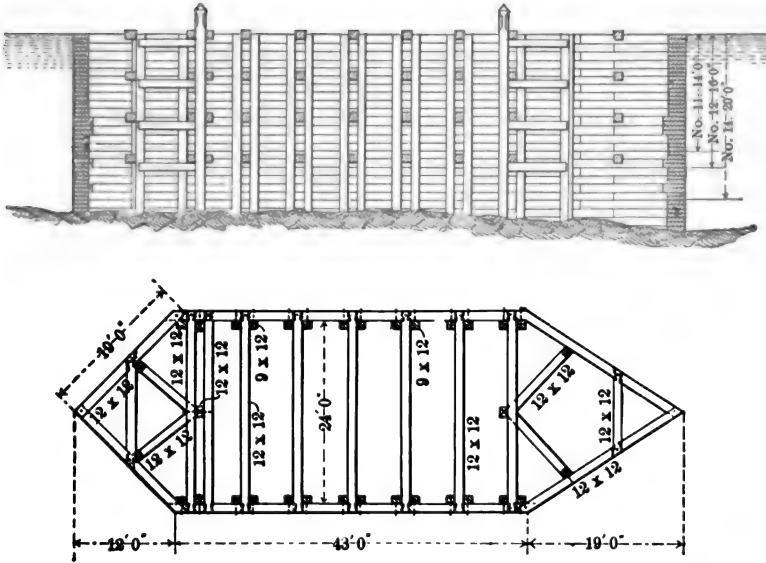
ST. LAWRENCE RIVER BRIDGE, CRIB AND COFFER-DAM, CANADIAN PACIFIC RAILWAY.
